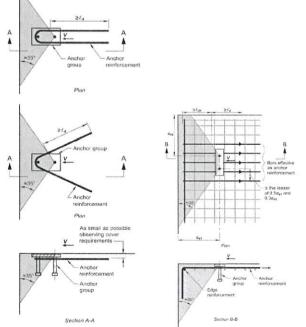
(a)—Hairpin anchor reinforcement for shear
